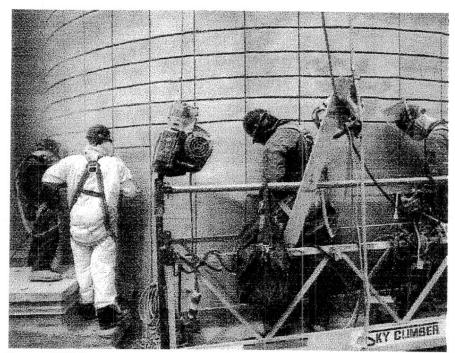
STRUCTURAL RETROFIT OF A CONCRETE TANK USING COMPOSITE RE-BAR
